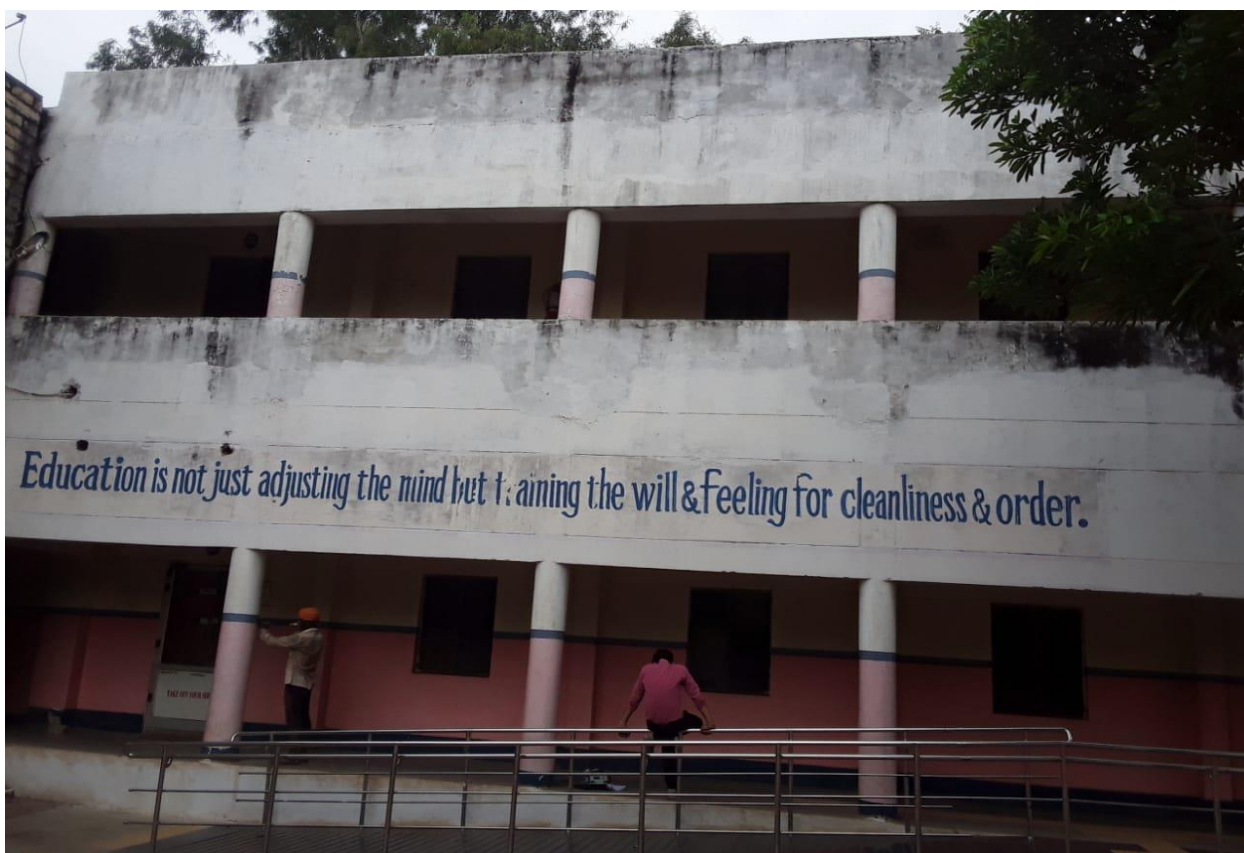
Front Elevation of the KV-1 block C (primary department) building Neemuch
